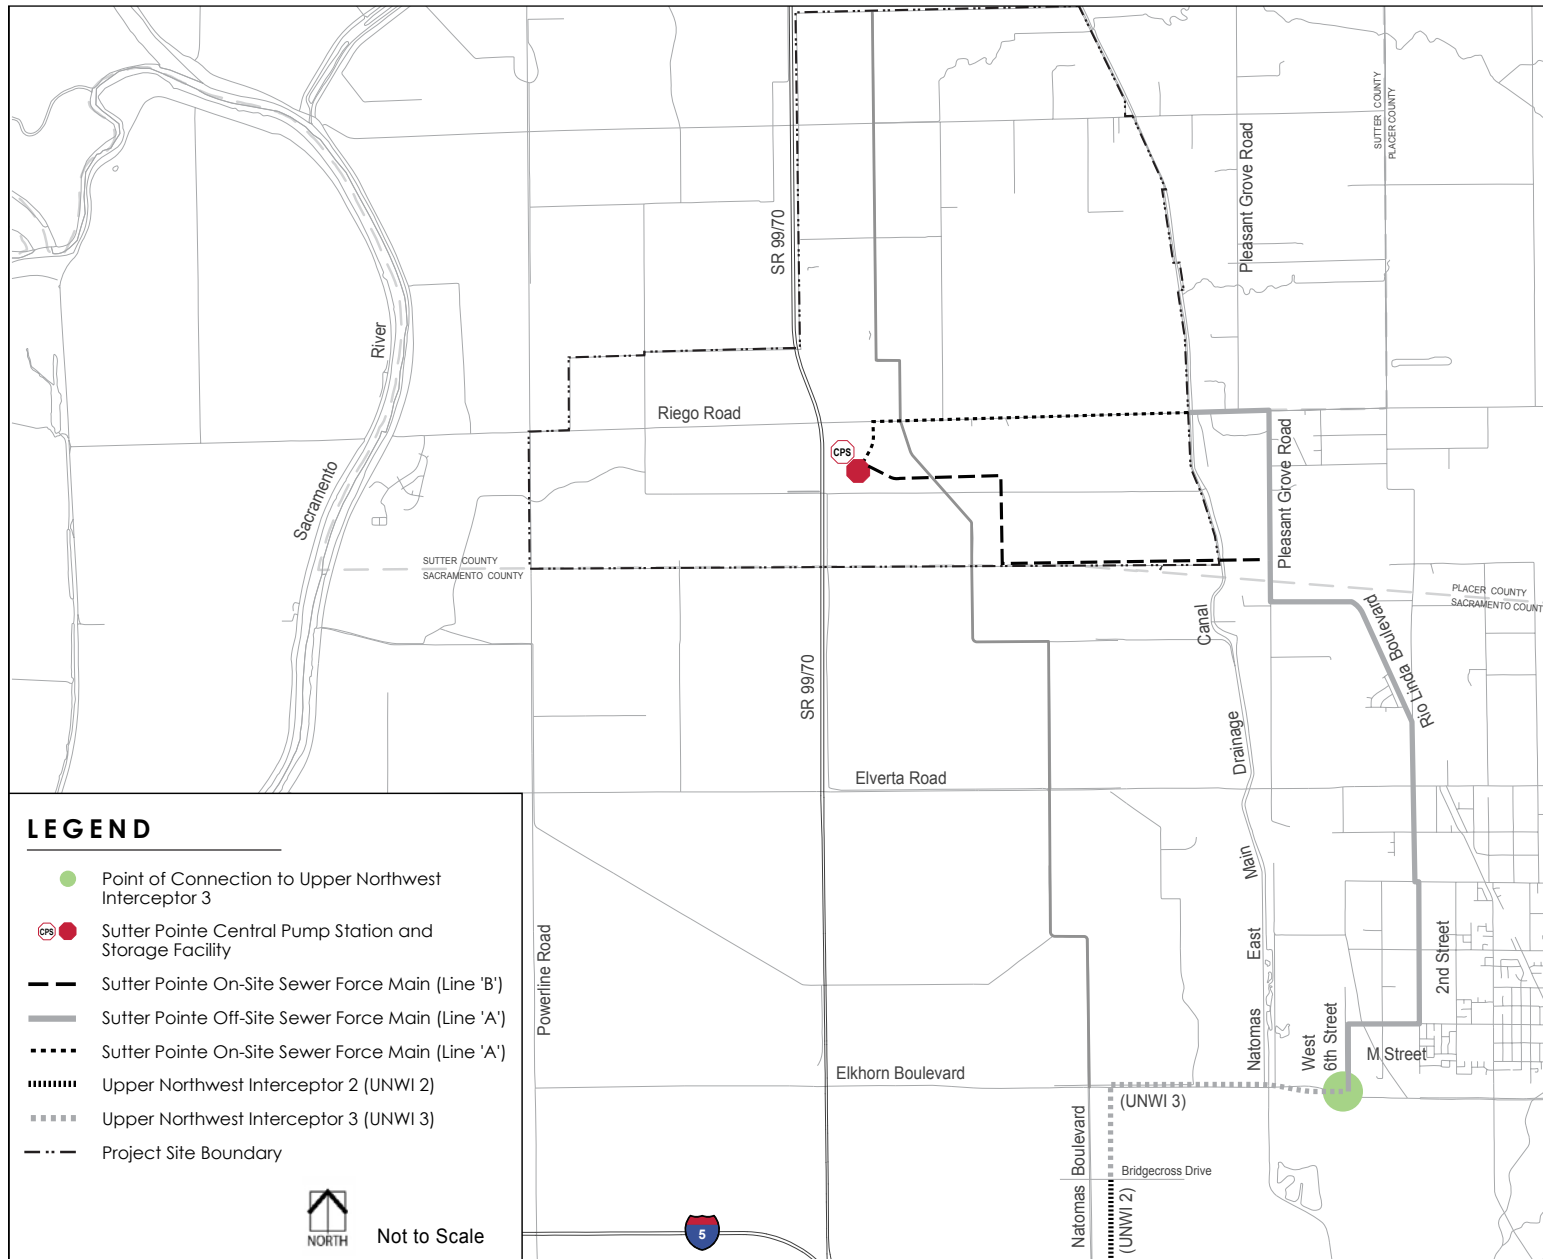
Backbone Sewer Plan (Off-site)
